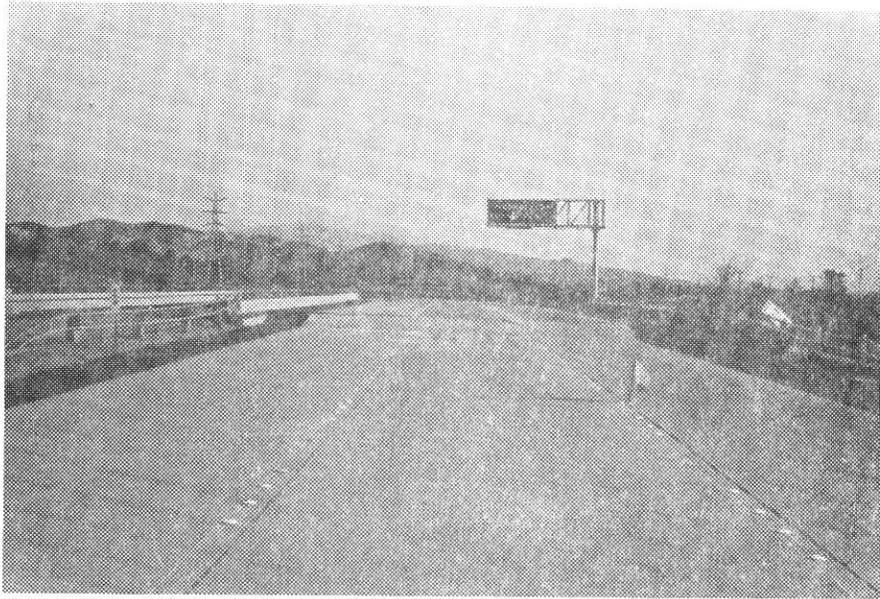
Looking east at eastbound structure of Polk Street Undercrossing. Note difference in profile between roadway and structure deck.
